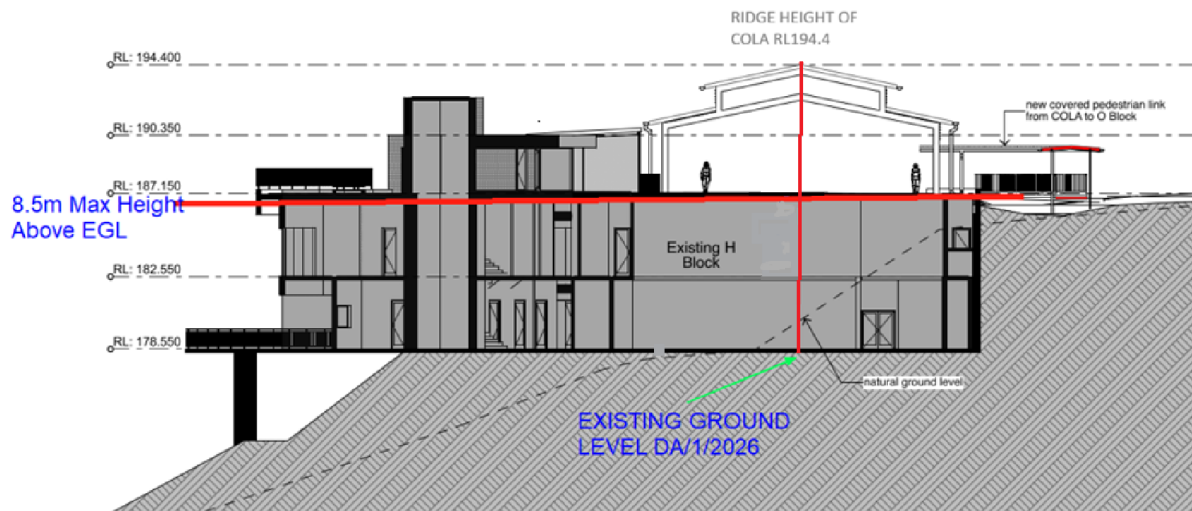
Extract of Section Plans (Source: Stanton Dahl Architects marked up by Council)
